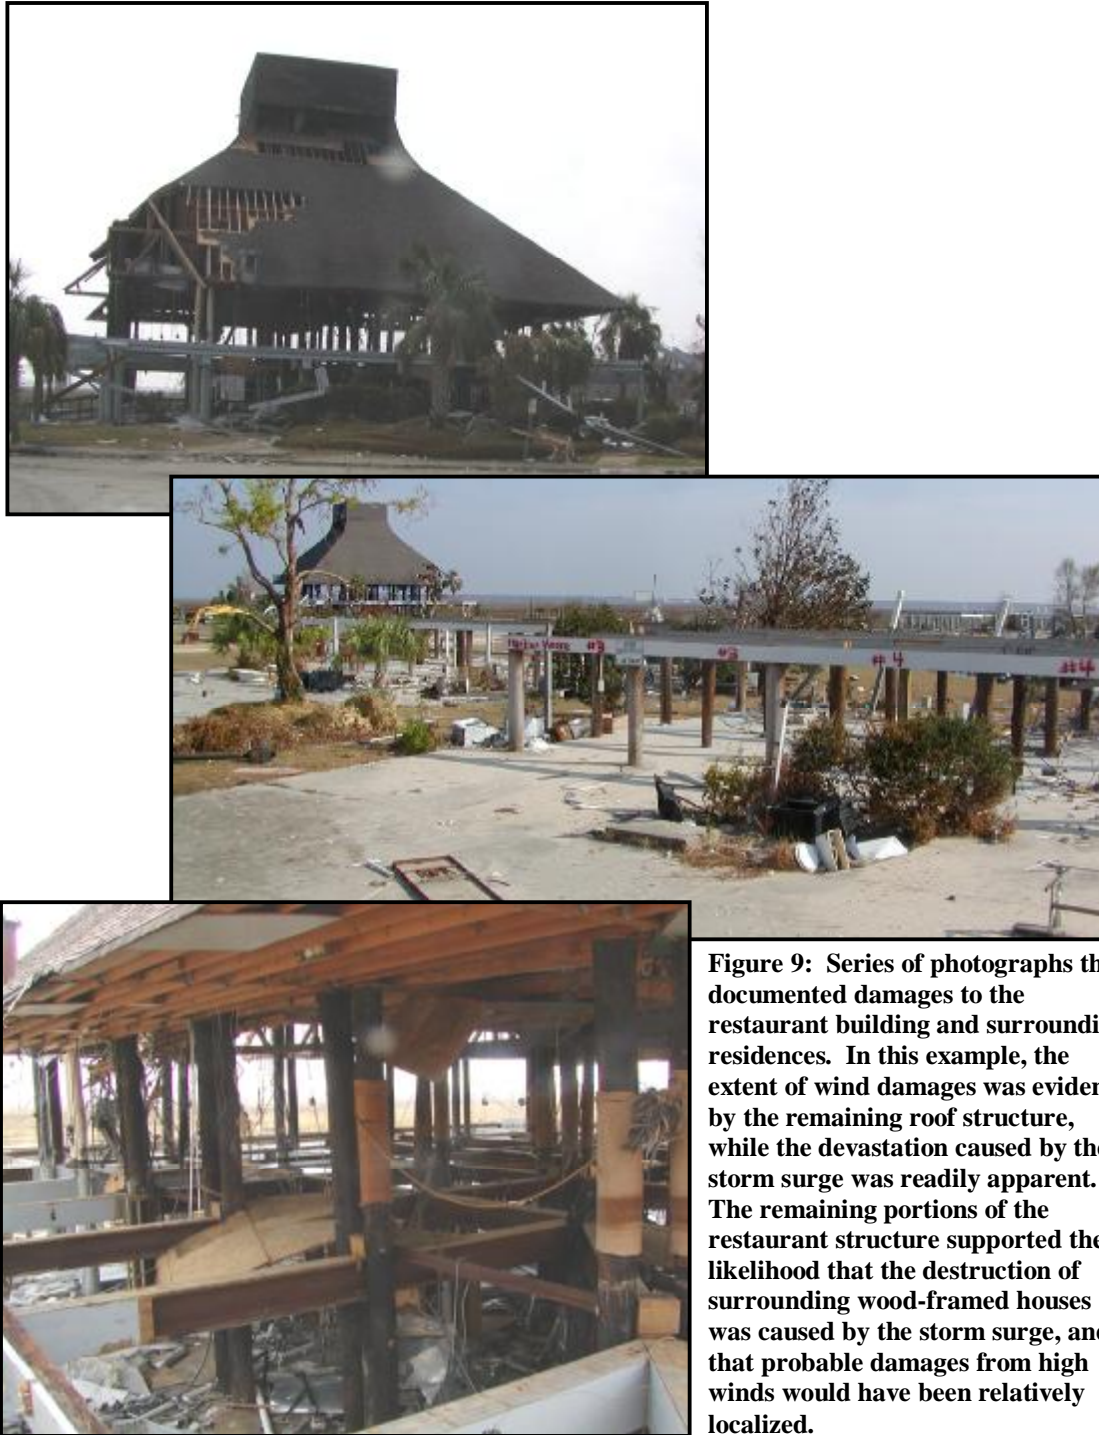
Series of photographs that documented damages to the restaurant building and surrounding residences. In this example, the extent of wind damages was evident by the remaining roof structure, while the devastation caused by the storm surge was readily apparent. The remaining portions of the restaurant structure supported the likelihood that the destruction of surrounding wood-framed houses was caused by the storm surge, and that probable damages from high winds would have been relatively localized.
